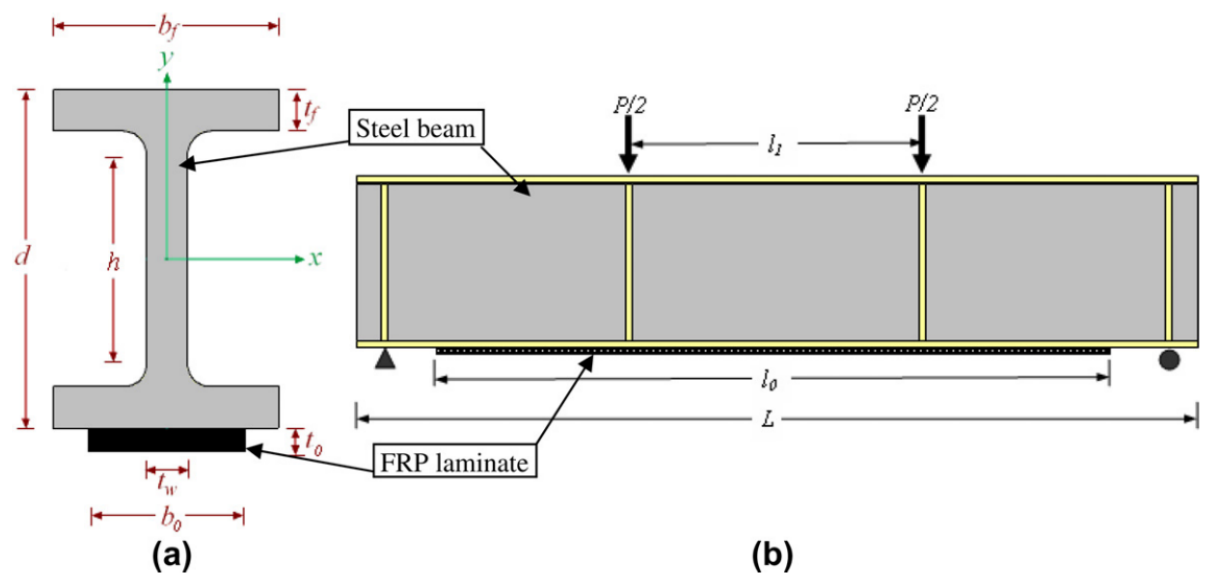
Schematic diagram of typical CFRP retrofitted beam specimen: (a) cross section, and (b) side elevation.
